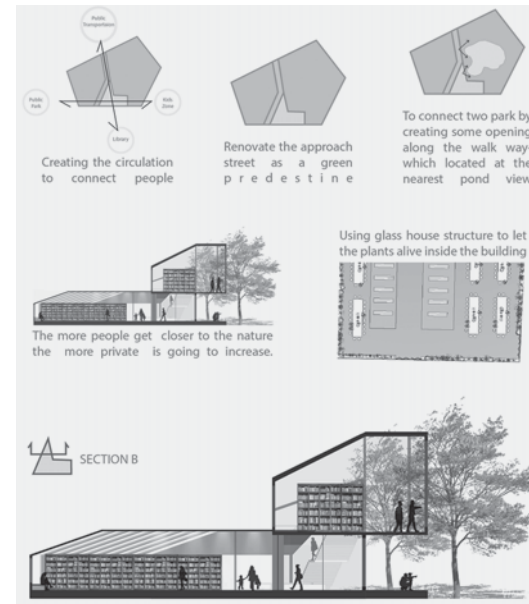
左頁/上 | To connect two park by creating some opening along the walk way which located at the nearest pond view. fig.02 左頁/下 | Section
